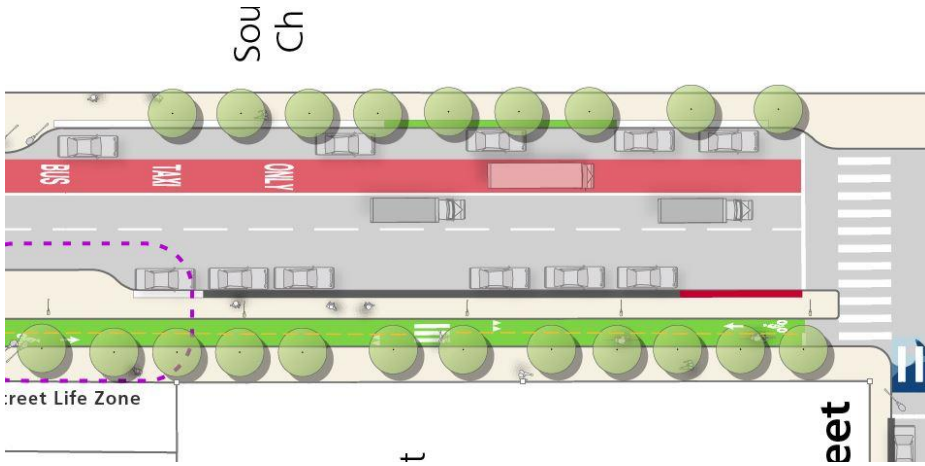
Typical Plan View of Folsom Street between 4th Street and 3rd Street
